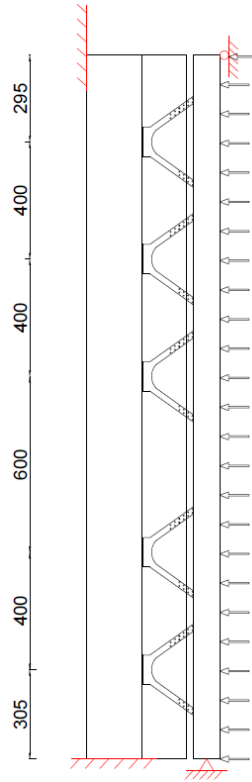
Suggested full-scale specimens under out-of-plane load: loading and support conditions (novel tie shown).
